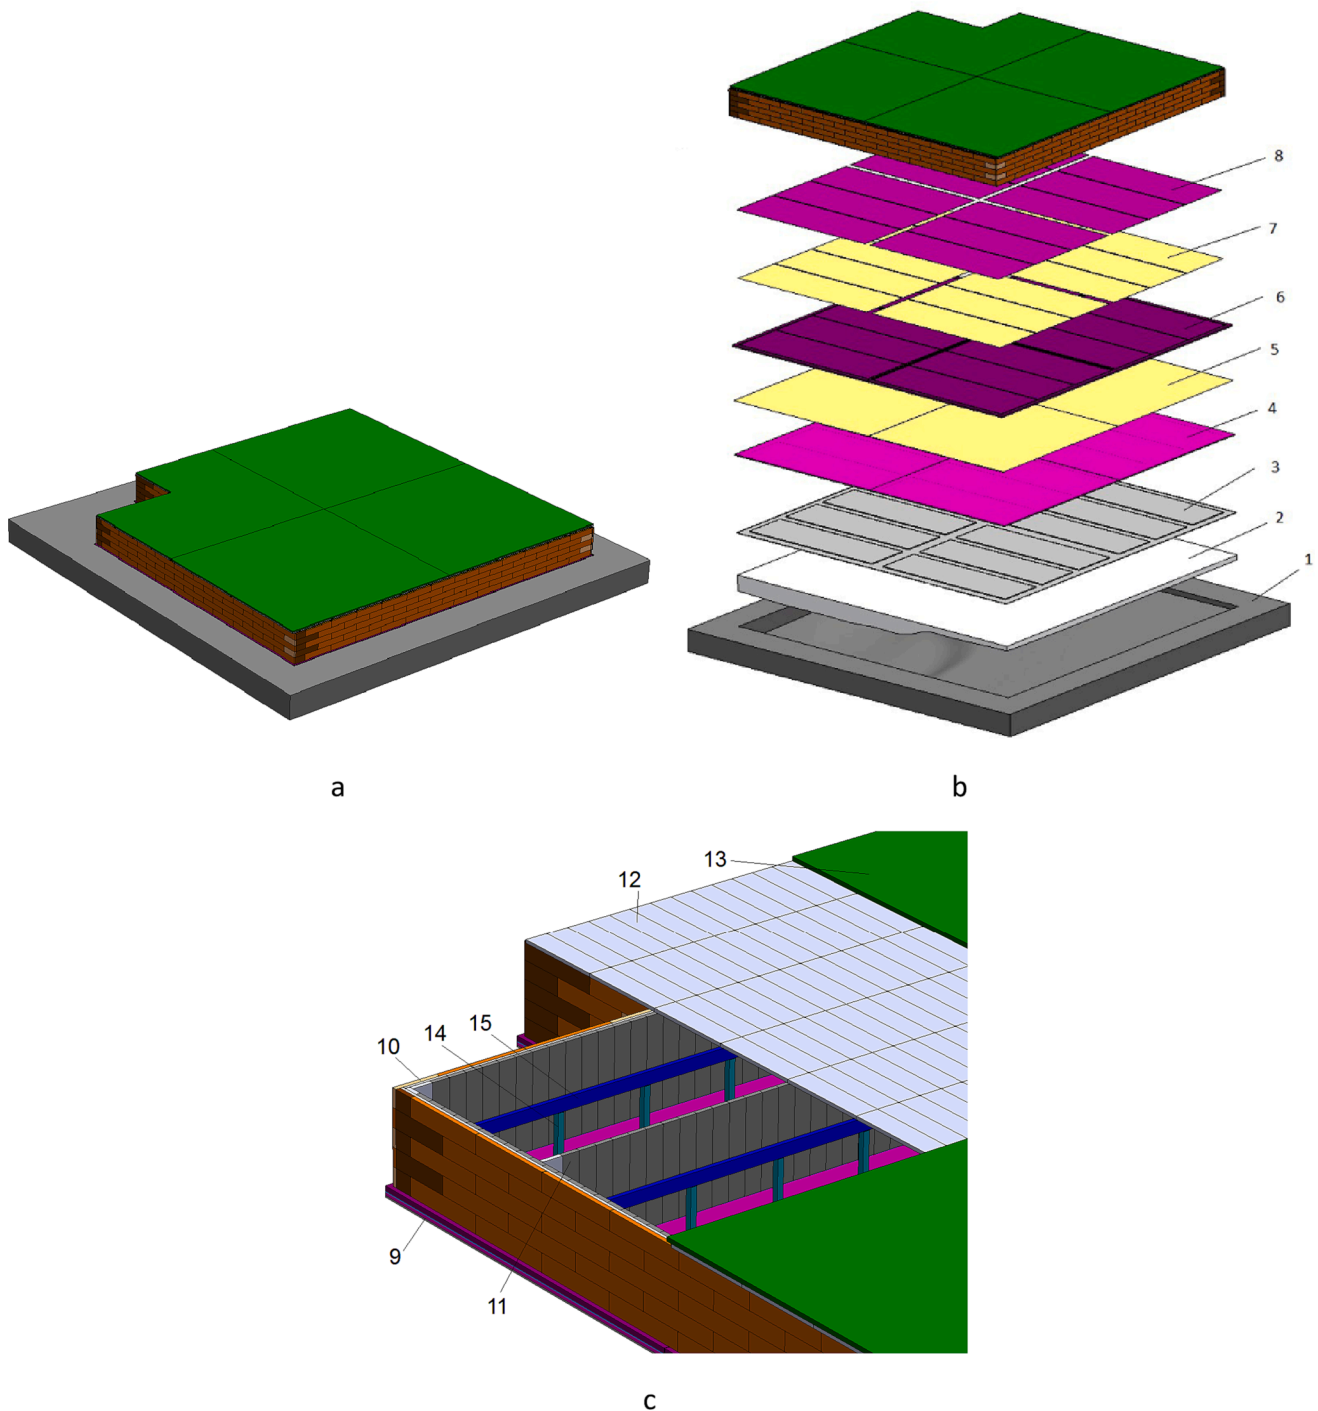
Spatial volumetric geometric model of Ignalina NPP building 158: a – general view; b – scattered view of the bottom part; c – fragment of the model without one of the top flooring panels and part of the bottom flooring panels: 1 – soil; 2 – engineering base (“bed”); 3 – levelling concrete layer; 4, 6 and 8 – the lower, middle and upper concrete layers of reinforced concrete foundation slabs, respectively; 5 and 7 – lower and upper equivalent reinforcement layers of reinforced concrete foundation slabs, respectively; 9 – reinforced concrete foundation slabs (include positions 4 to 8); 10 – exterior walls (3 layers); 11 – interior walls; 12 – lower layer of the flooring; 13 – upper layer of the flooring; 14 – pillars; 15 – collars.
